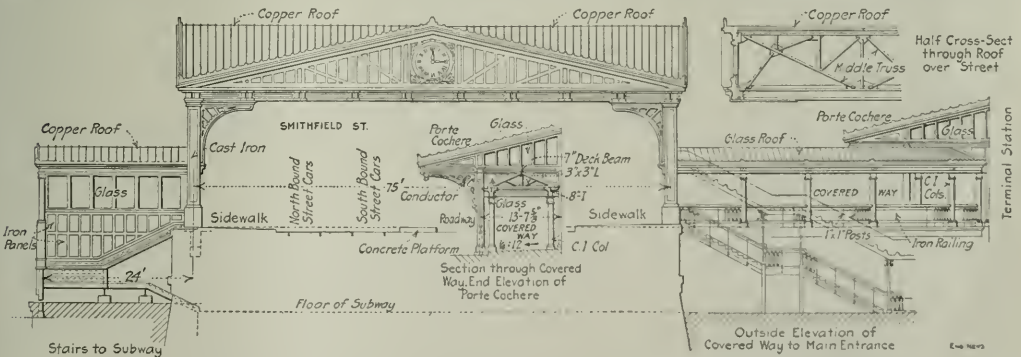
SECTIONAL ELEVATION OF FACILITIES AT ENTRANCE TO PASSENGER STATION
